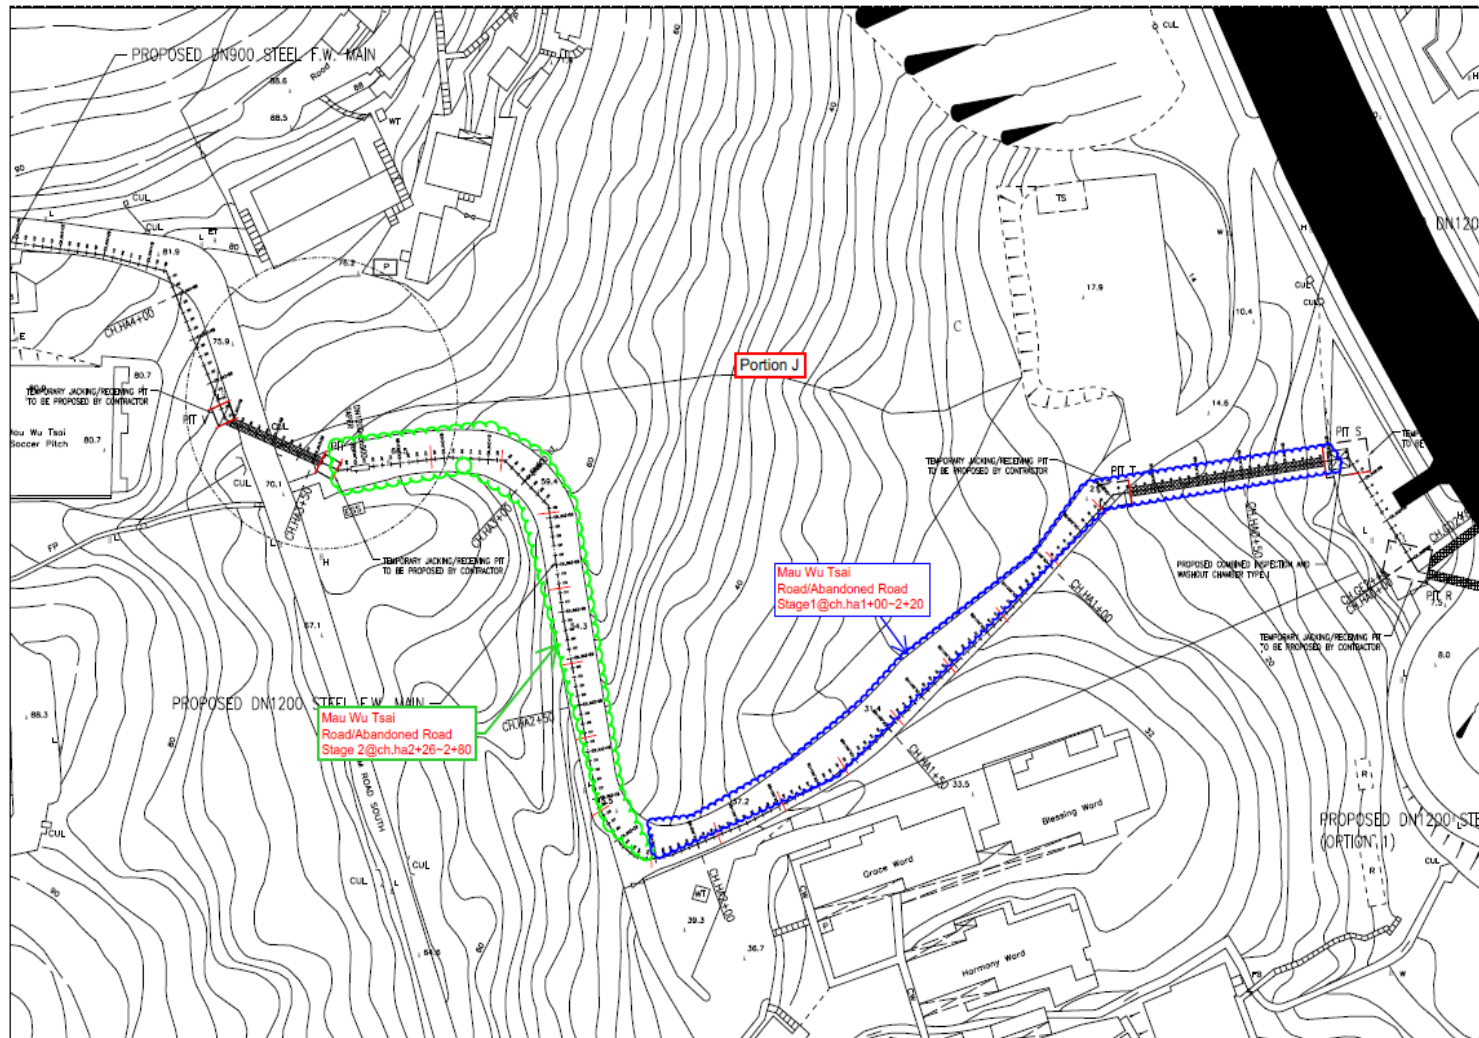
Location Plan for Portion J – Abandoned Mau Wu Tsai Road
